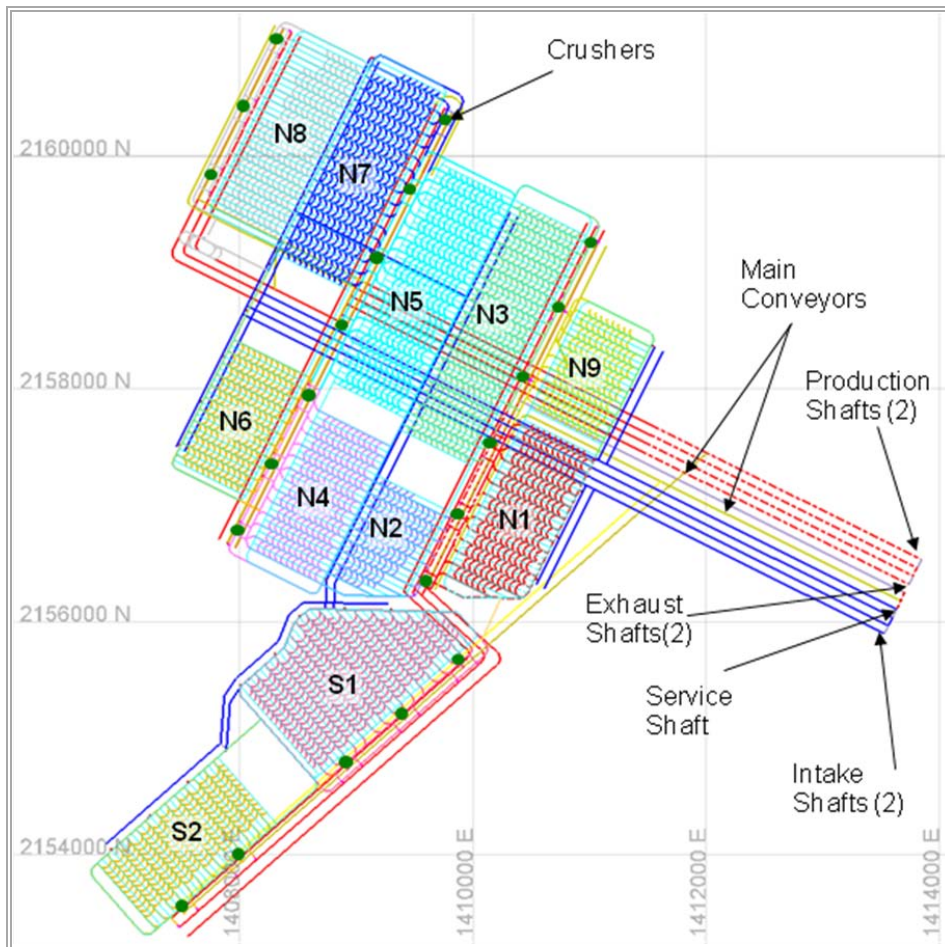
Underground Mine Design Schematic – Plan View
